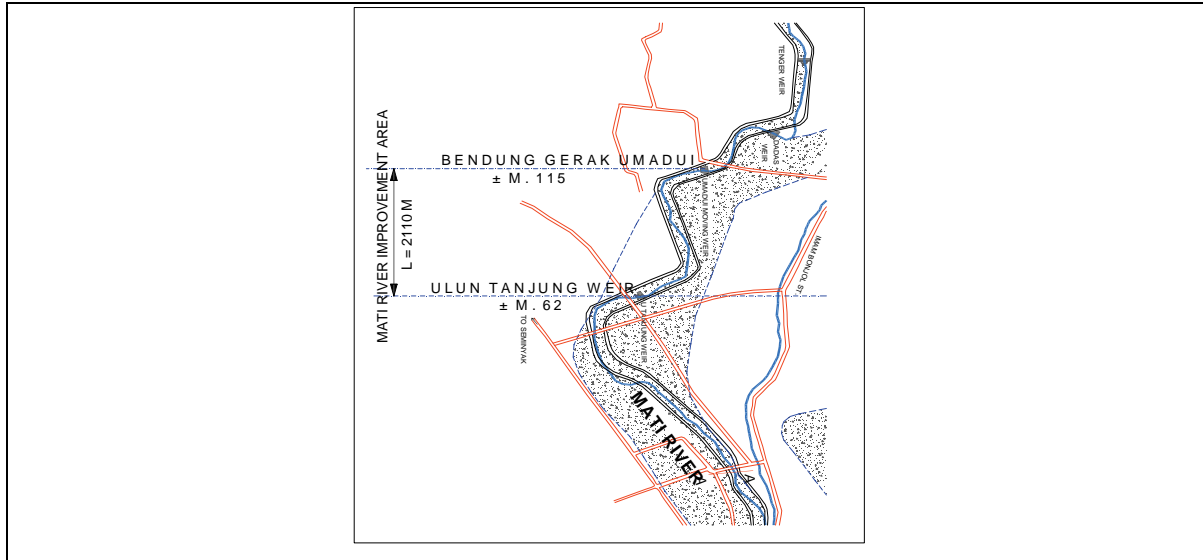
Plan for Section of River Improvement for Mati River
